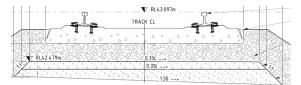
Cross section of completed track after 3rd shutdown, top to bottom: rails and sleeper, bottom ballast, 2 x Railpave layers
